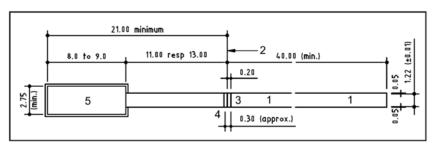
Facility for the Triple Jump (Dimensions in m)
